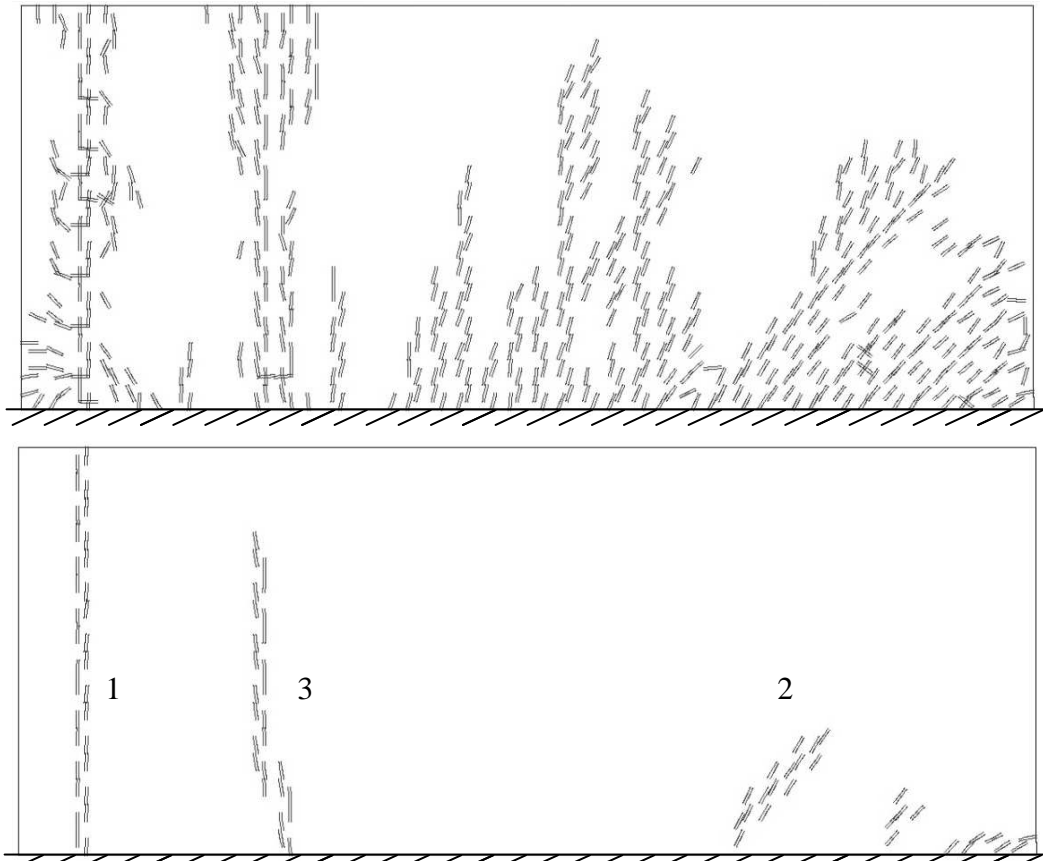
Crack pattern at  $\varepsilon_{cs} = 1 \text{ ‰}$  for 0 and 100 % fully developed cracks for fibre reinforced concrete with cross-section 0.
